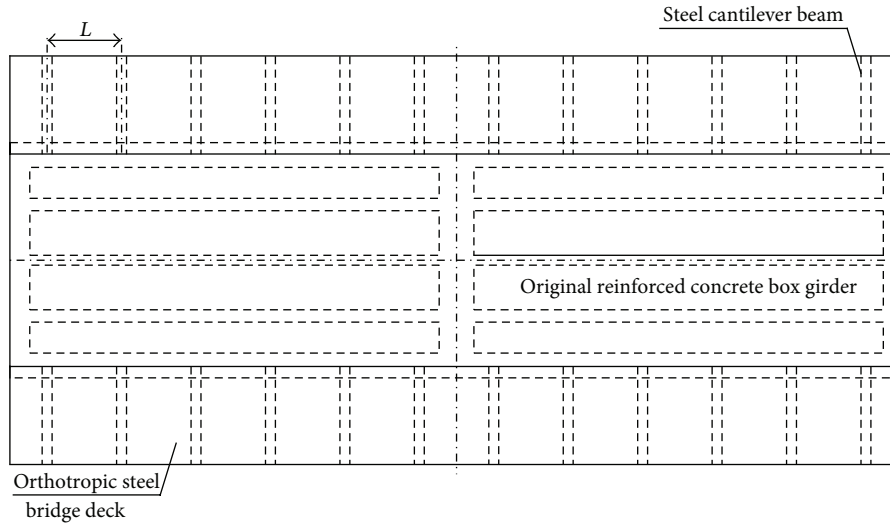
Plane figure of original box girder widened by steel cantilevers.
